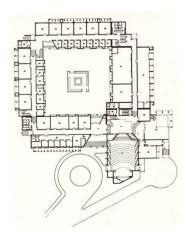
Ground floor plan of main building (Source: Naeem Pasha official website ,2022
